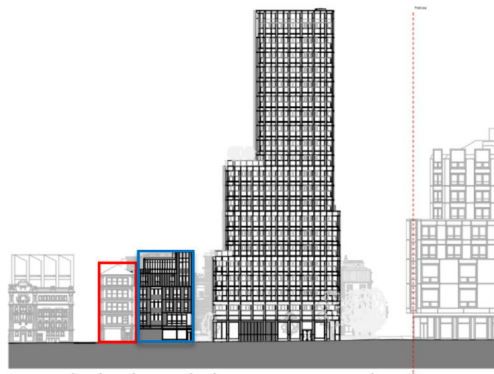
Proposed High Holborn elevation (Embassy of Cuba defined in red and High Holborn in blue)
